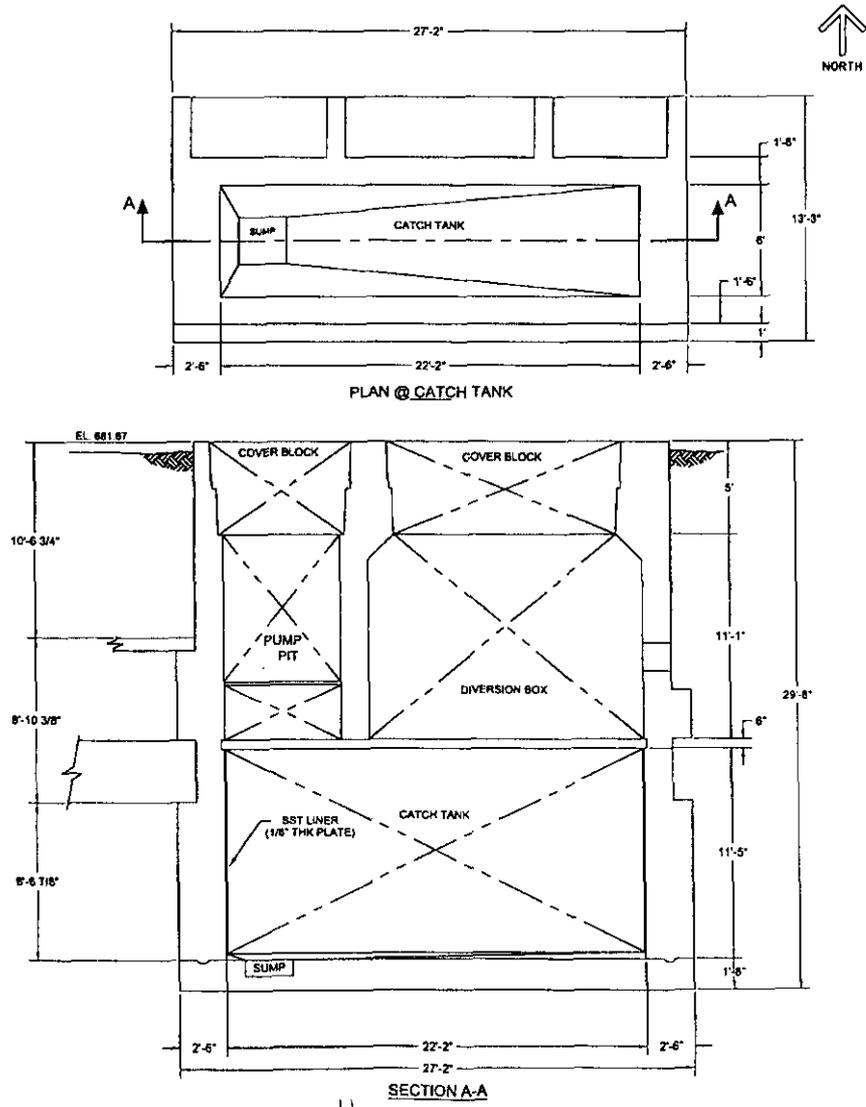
SITE PLAN – 241-AX-152 Catch Tank.
